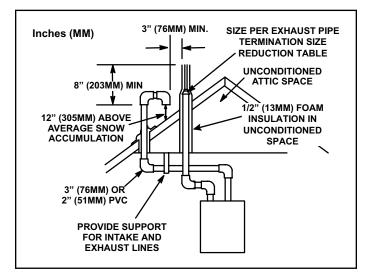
Direct Vent Roof Termination Kit (15F75 or 44J41)
